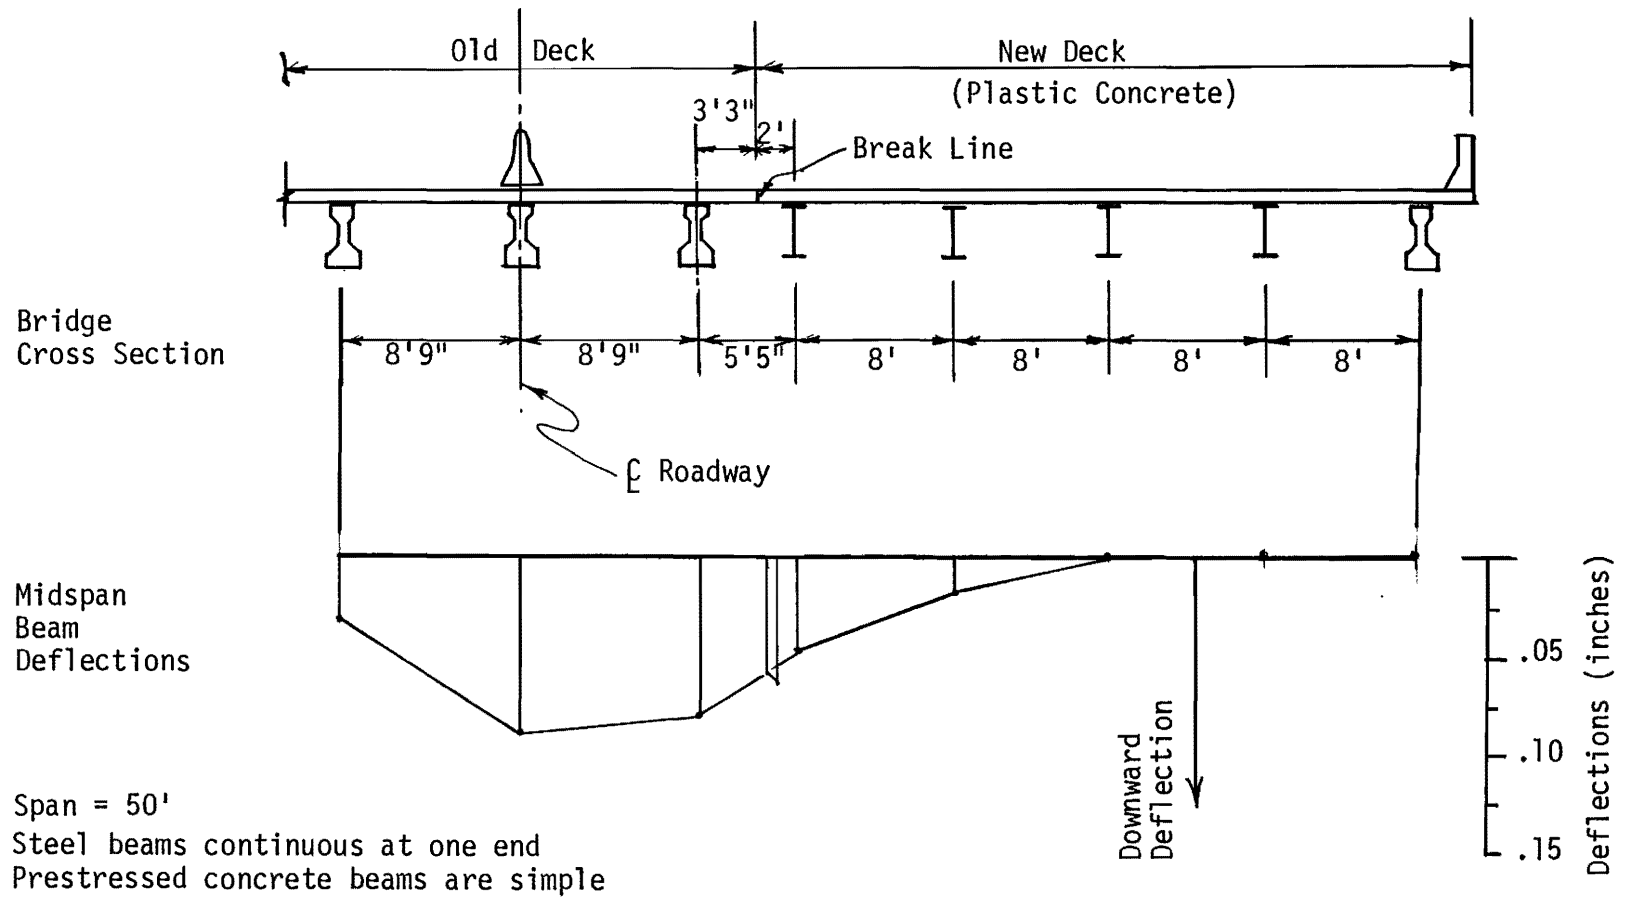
b. US 75 & White Rock Creek, Dallas, Southbound (50' span)
